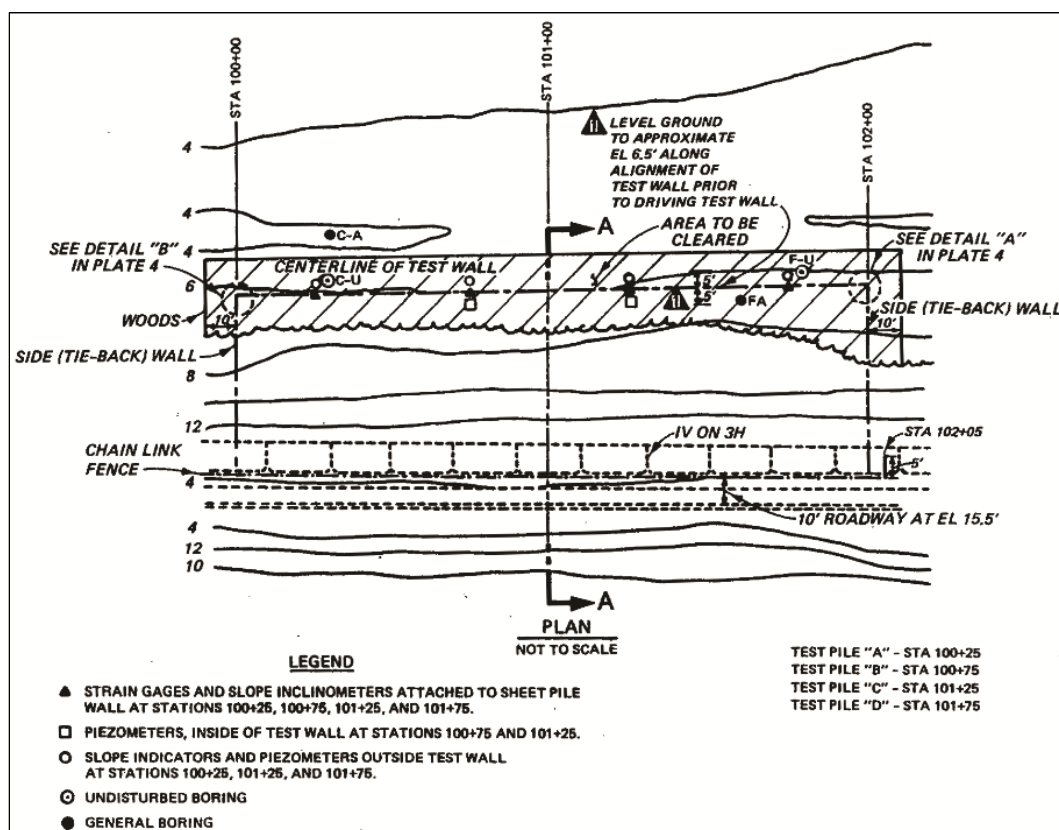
Location of instrumented sections of I-wall (Jackson 1988).
